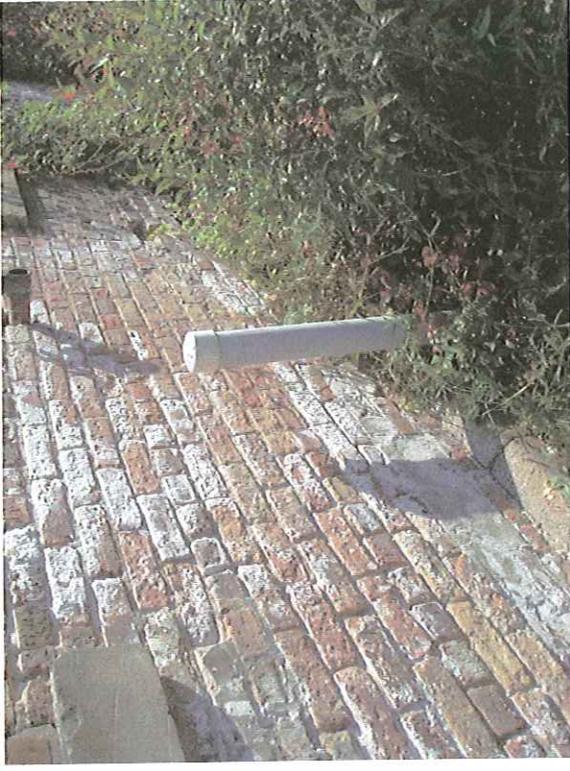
4-inch PVC pipe suspected of being a communication conduit extending out of ground next to mill building opposite Garver Cottage. Other pipe at top of photo is old molasses tank fill pipe.
